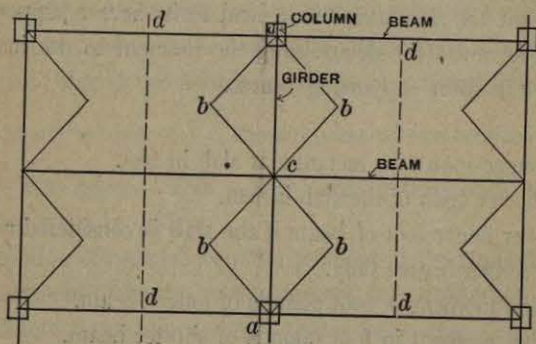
Distribution of Beam and Slab Loads to Girder. (See p. 432.)
